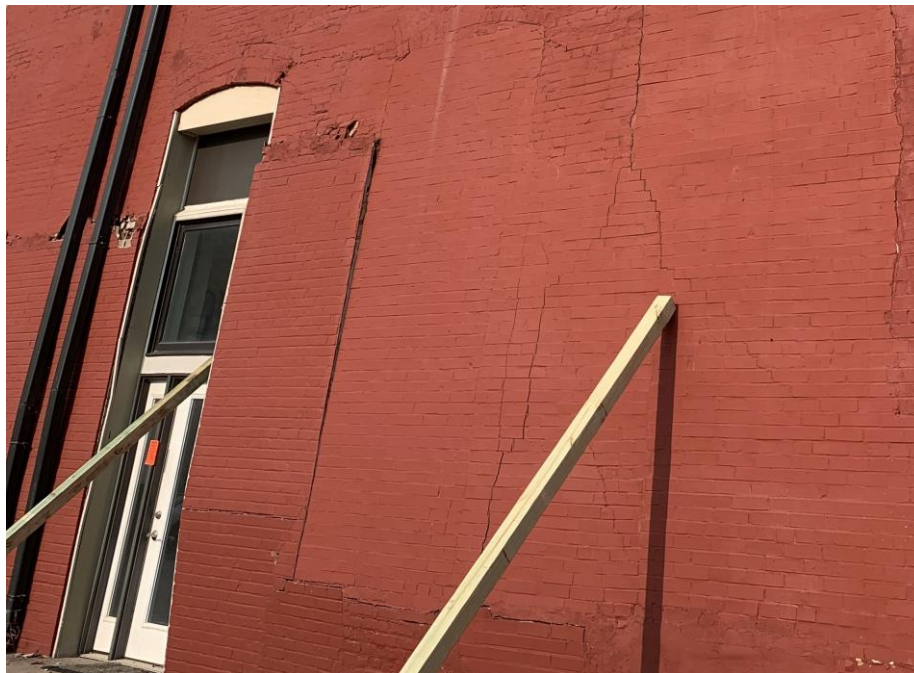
Image from City file 23-9778 exhibiting April 2023 repair work.
